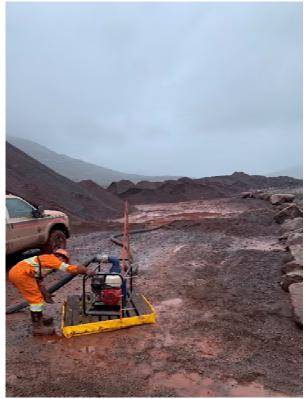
July 10th, 2019 – Pump set up to bypass ditch.
